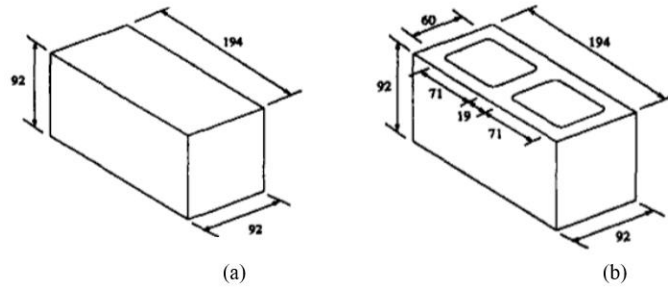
Geometric details of masonry units for specimen 5,6,11[29]
